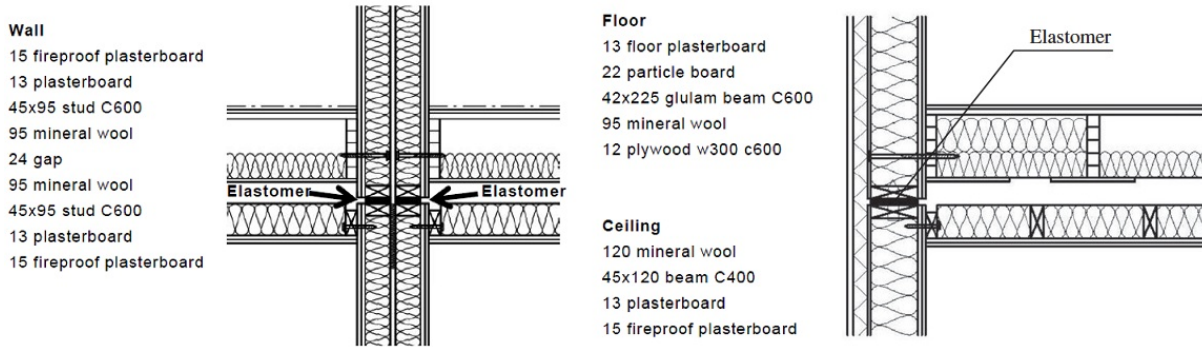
Drawings of the TVE building system, showing sections of the floor and ceiling structures and the junctions with apartment separating wall (left) and façade wall (right).
